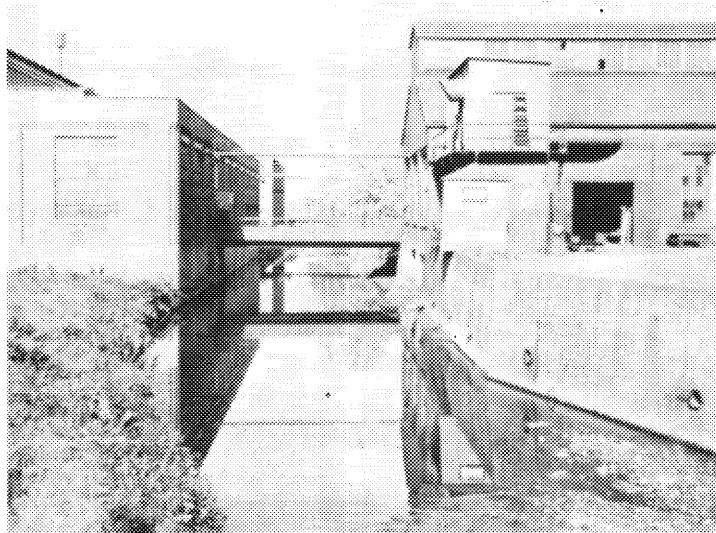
View looking upstream from Center Street. Industrial building walls form the sides of the channel in this area.
